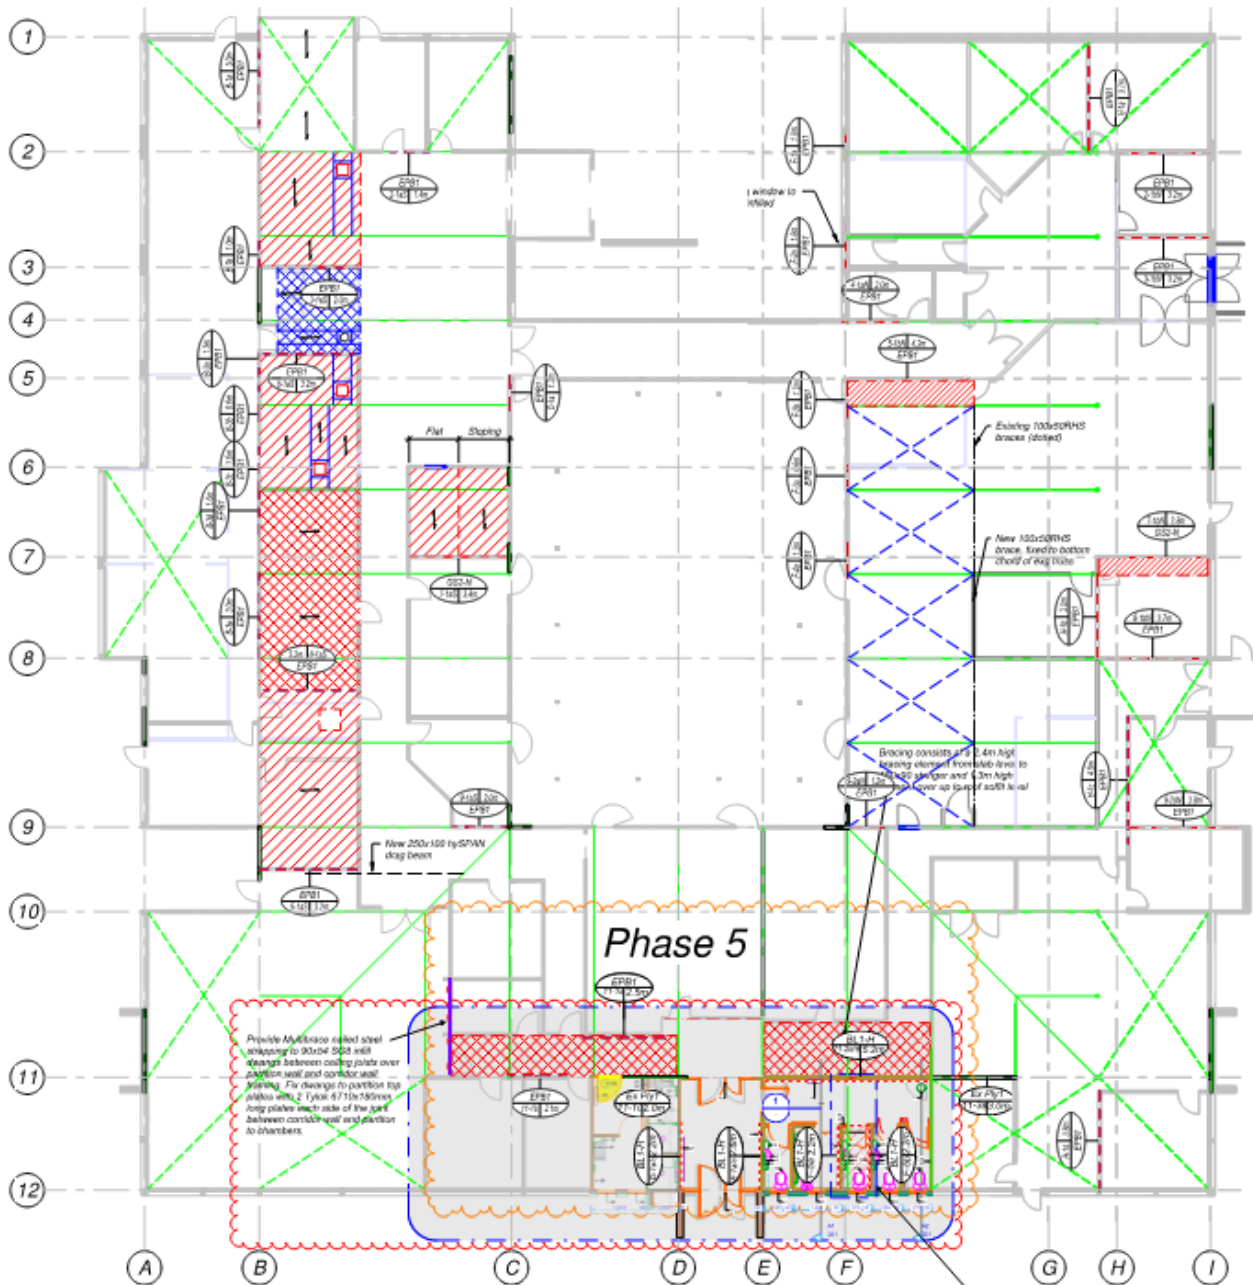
Plan view of William Fraser Block showing Existing Structure, Bracing walls and new alteration provisions.
